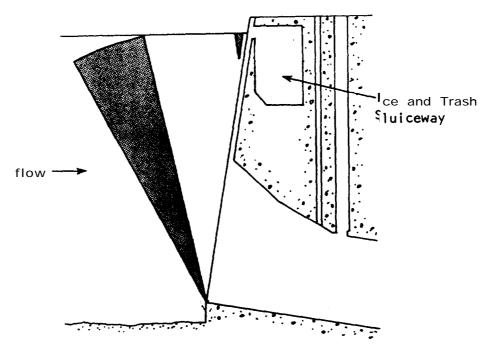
Cross section of the powerhouse showing transducer location and orientation. The Dalles Dam, 1985.
